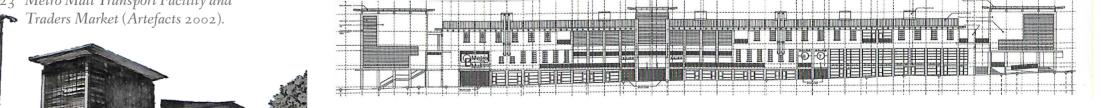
Bree street elevation of Metro Mall (Deckler, Graupner & Rasmuss 2006:63).
